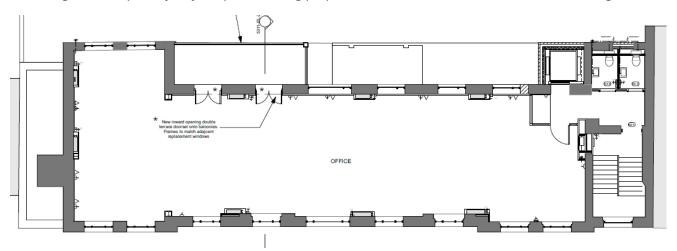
Proposed second floor plan showing proposed balcony. Balcony to be level with rear wing.
